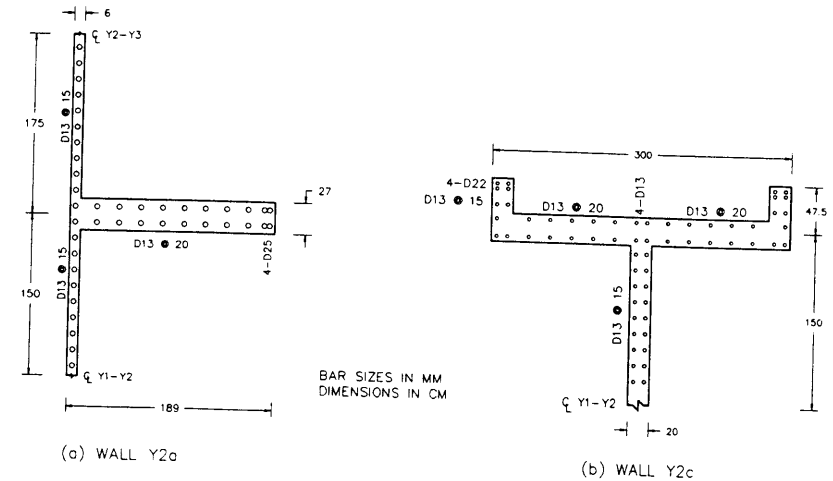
Wall Geometry and Reinforcing Details for BRI Test Structure
